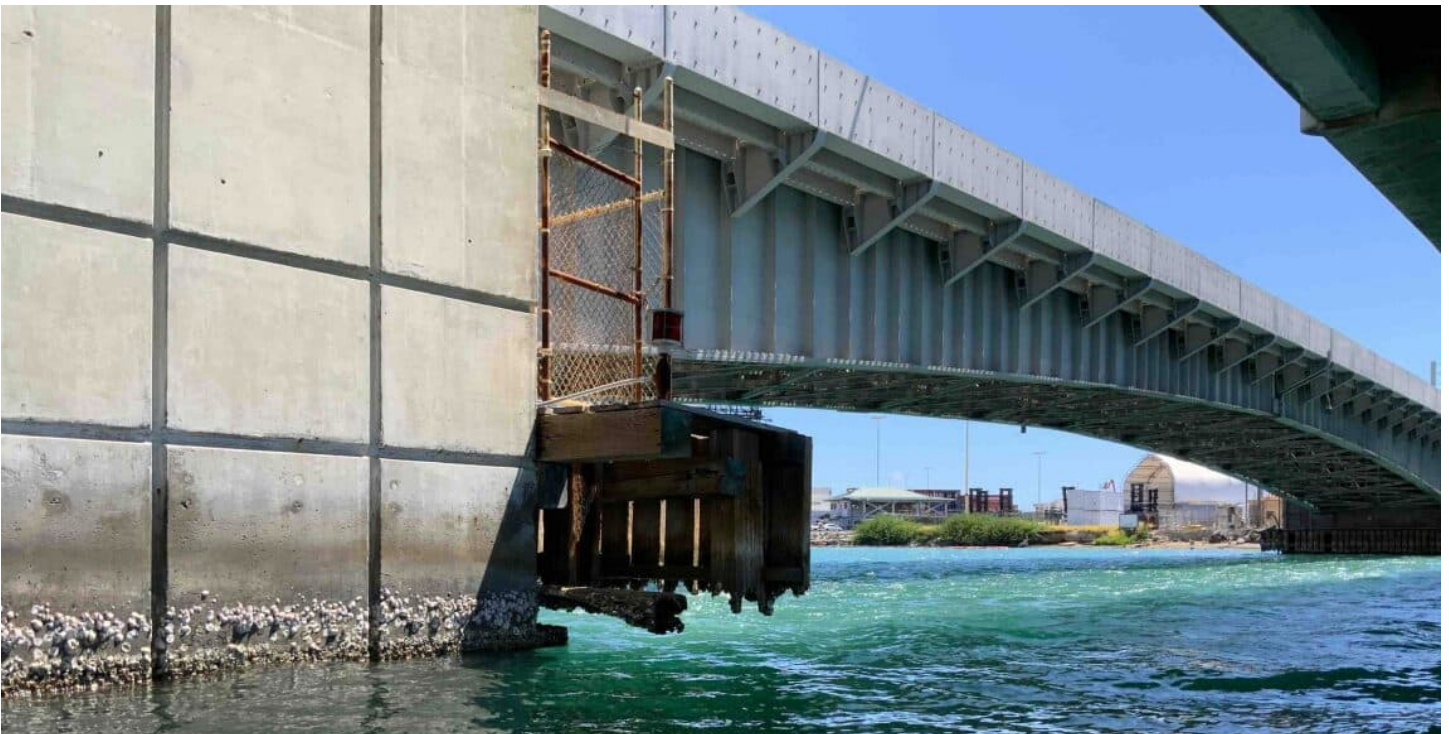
Detail of bridge pier and maintenance shaft adjacent to bridge bascule, facing east.
